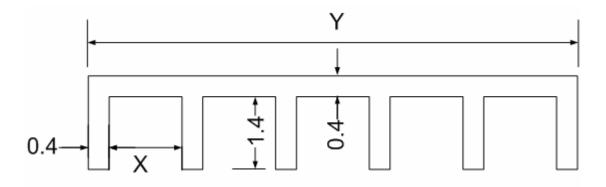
Structure component geometry in metric units, x is defined as the distance between the girders and y is defined as the overall width of the bridge deck cross section
